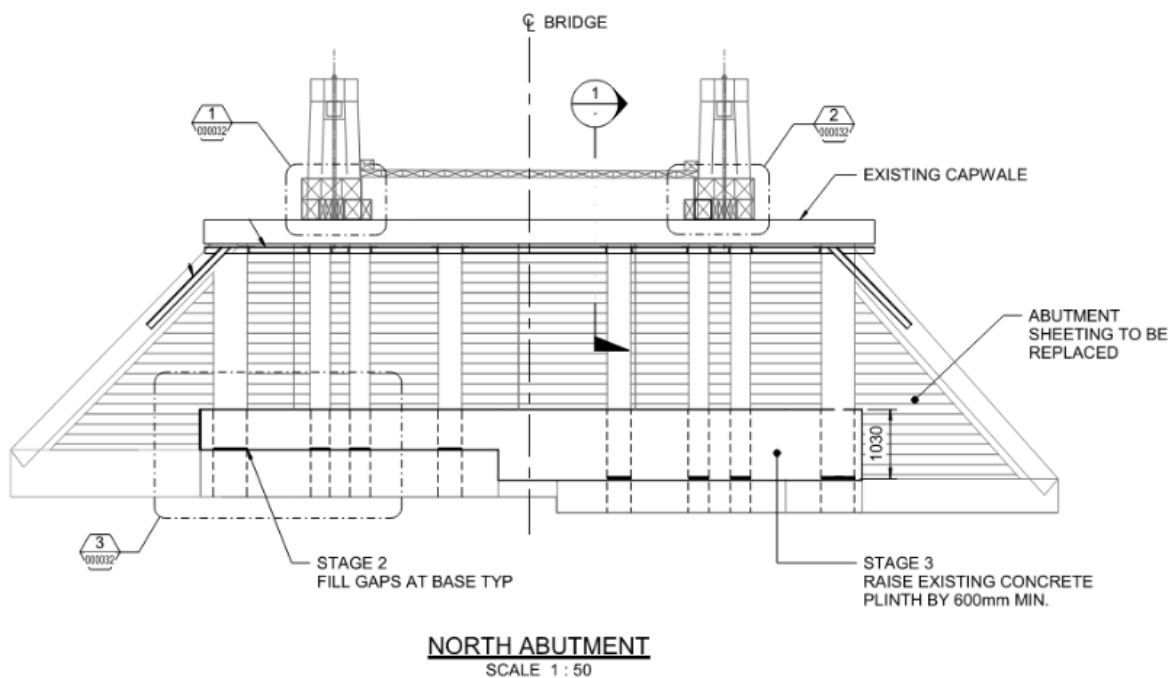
Proposed concrete plinth raising. (Source: 520212TP-AURC-B00390-ST-DRG-000034 and Design Report, Aurecon 2023)
